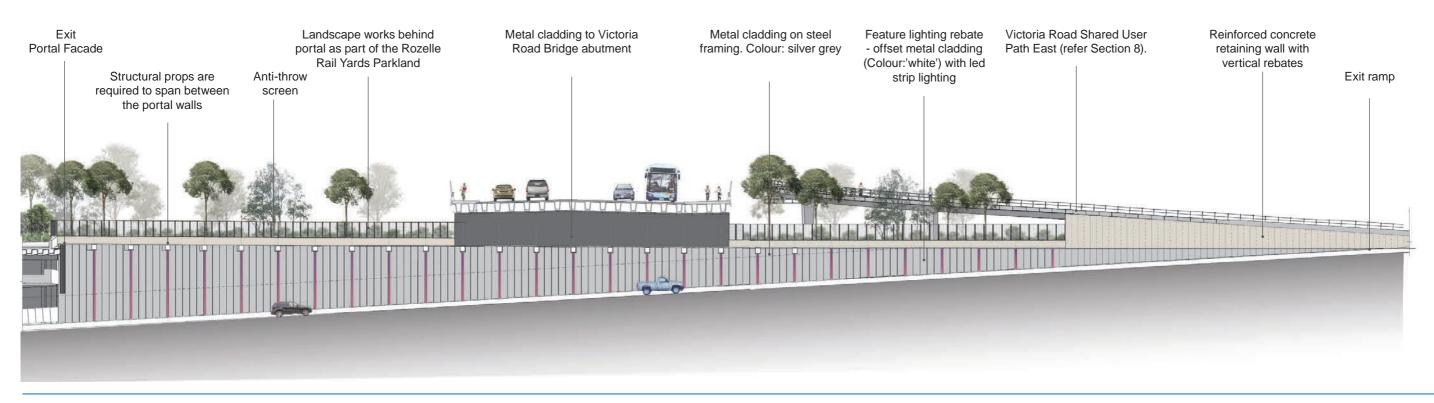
M4-Anzac Exit Portal - North dive wall elevation
